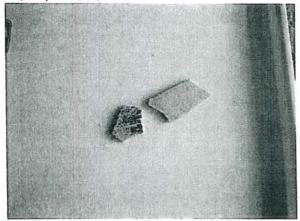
Photo of asbestos containing FloorTile – Beige and Black Mastic, Samples 11A, 11B, 11C and 20A.
